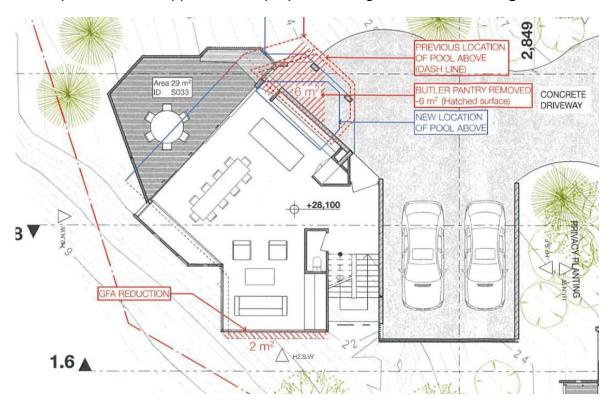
Extract from Level 2 Floor Plan – approved DA plans.
